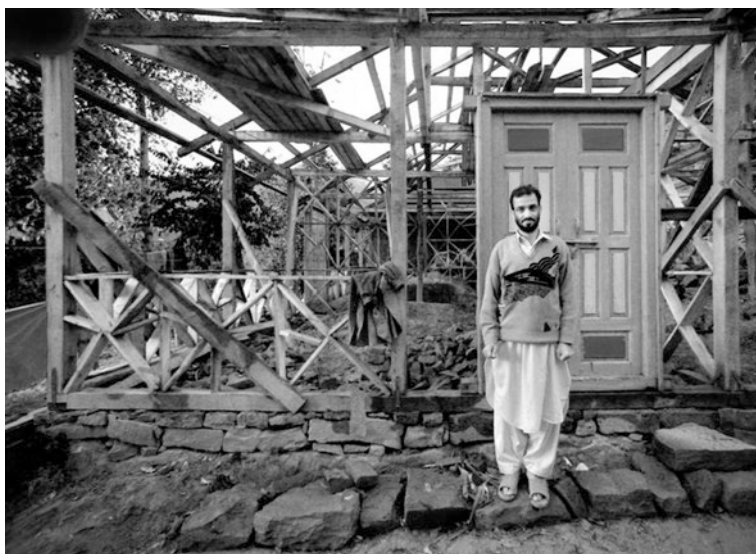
The owner standing in front of his house under construction showing the light timber frame of *dhajji* construction before the rubble stone masonry with mud mortar infilling. His unreinforced rubble stone house had collapsed in the earthquake and he and his neighbors proceeded to rebuild with *dhajji* when they saw that the only house to survive in the village was the only one of *dhajji* construction and that the one building of RC construction had also collapsed. Photograph by © Randolph Langenbach
